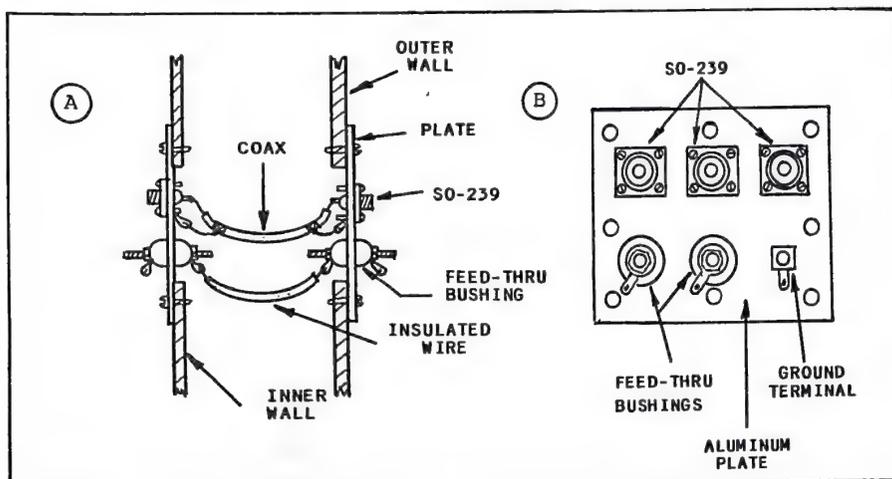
Method for bringing cables and wires into the ham shack. Holes are cut in the inner and outer walls of the house to allow installation of identical aluminum plates (2) opposite one another, as shown at A. The illustration at B shows a typical wall plate. It will accommodate three coaxial cables, two single-wire antennas, or balanced feeders. A bolt is used at the lower right for bringing the ground system into the ham shack. Caulking compound should be placed under the outer-wall plate to serve as a weather seal.
